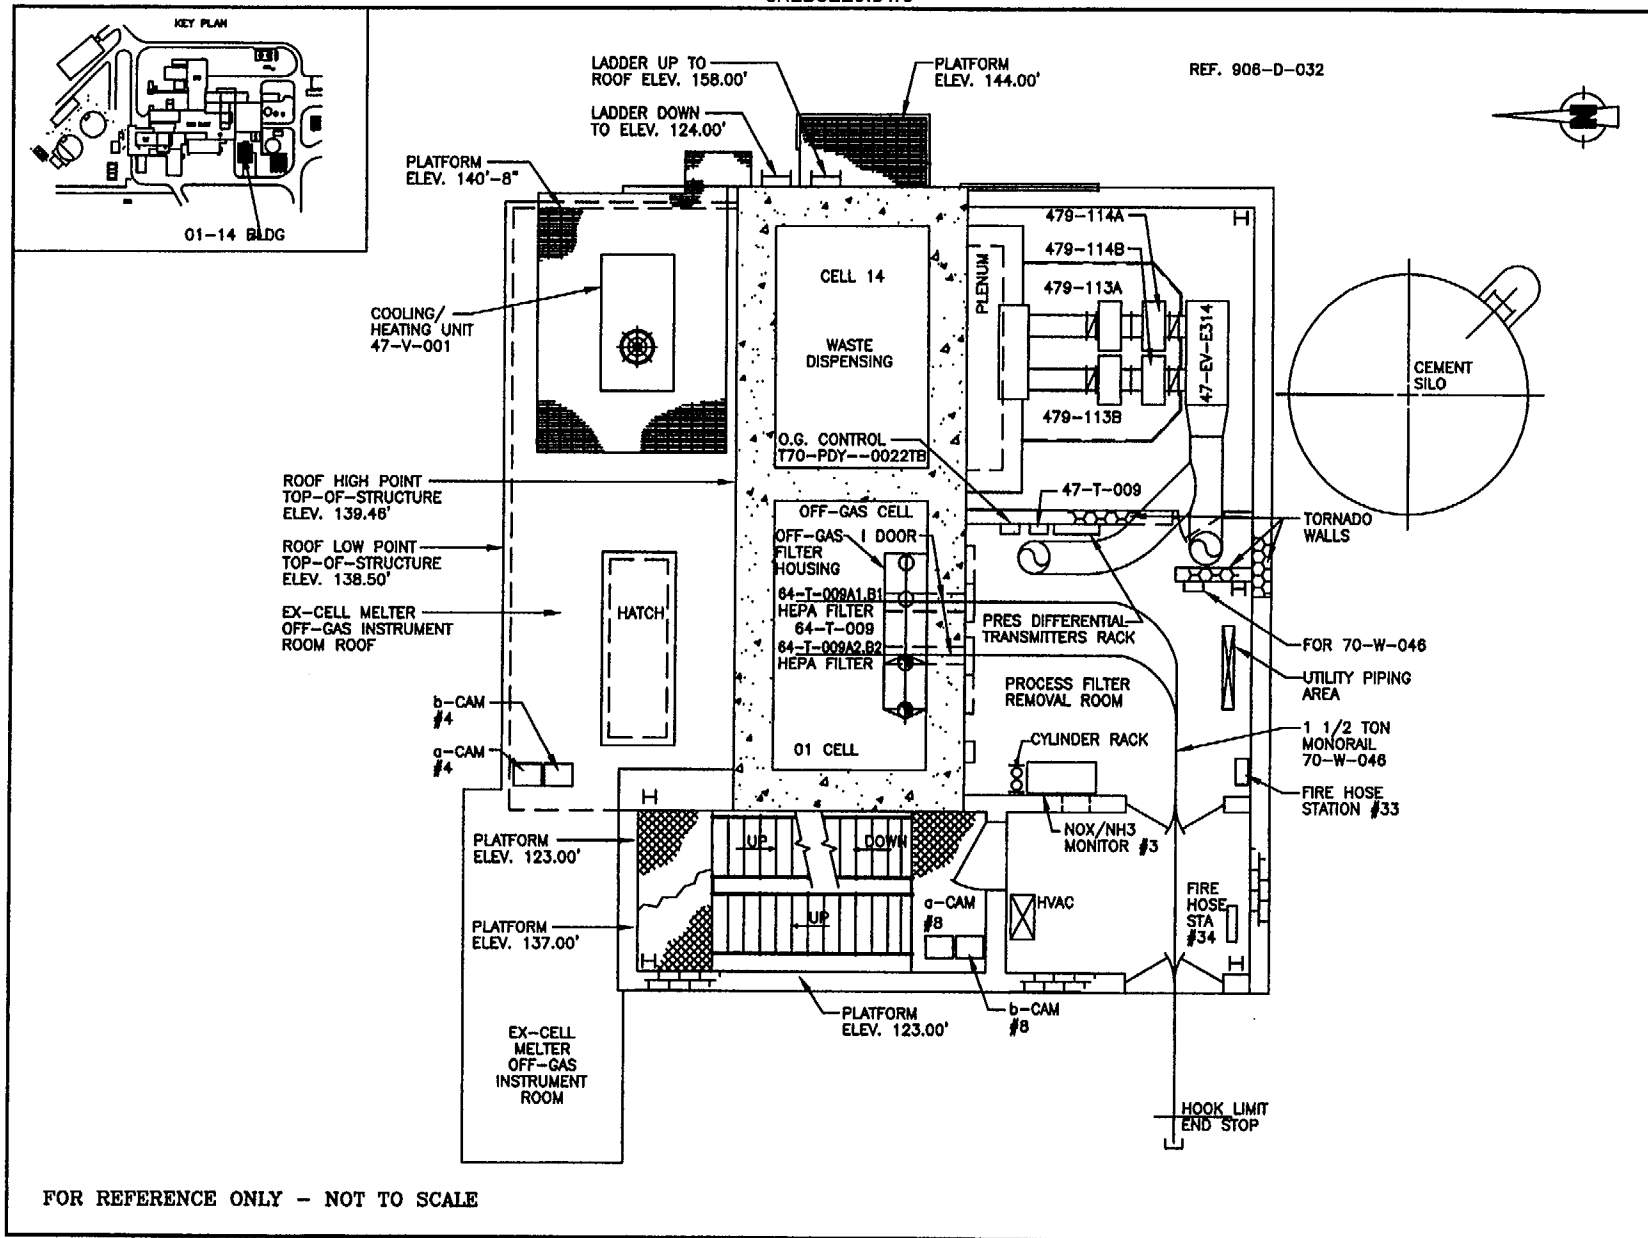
General Arrangement - 01/14 Building Plan Elevation 130.0'
